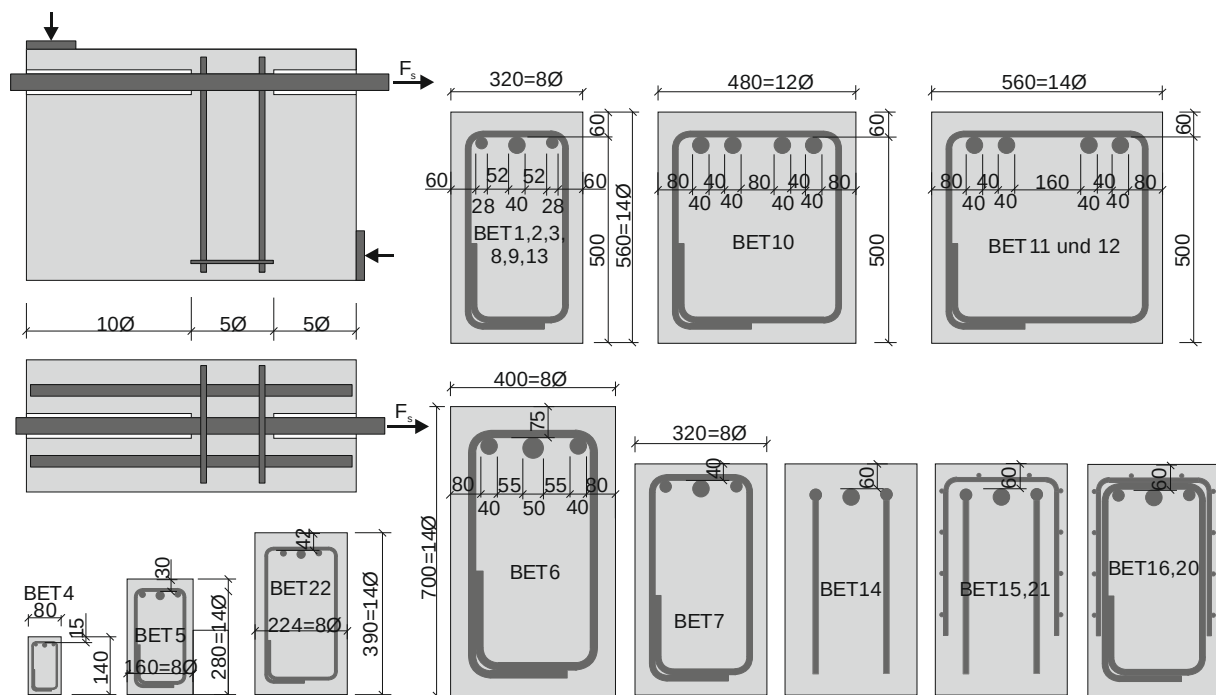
Beam-end test specimen dimensions, typical front and top view (left) and cross-sections for BET-1 to BET-22 (right)
